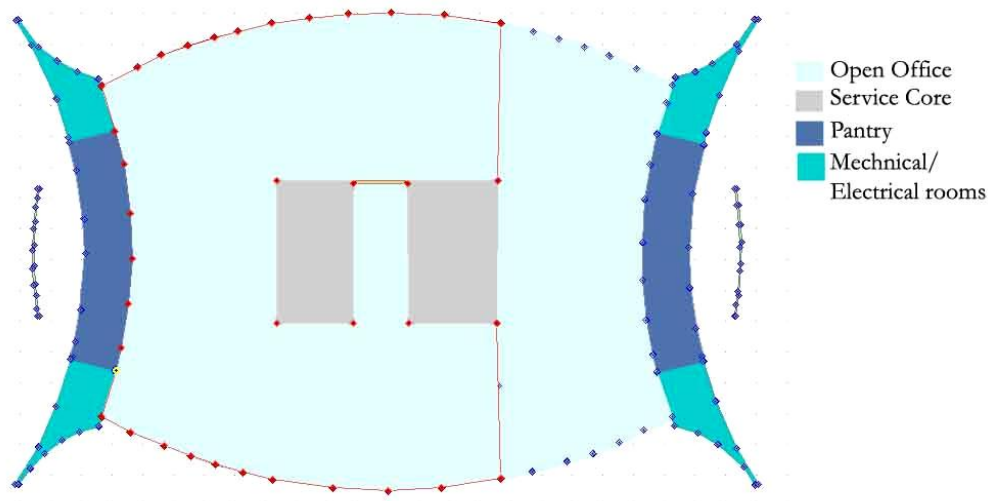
Zoning done in a typical floor in INFOTECH building.
